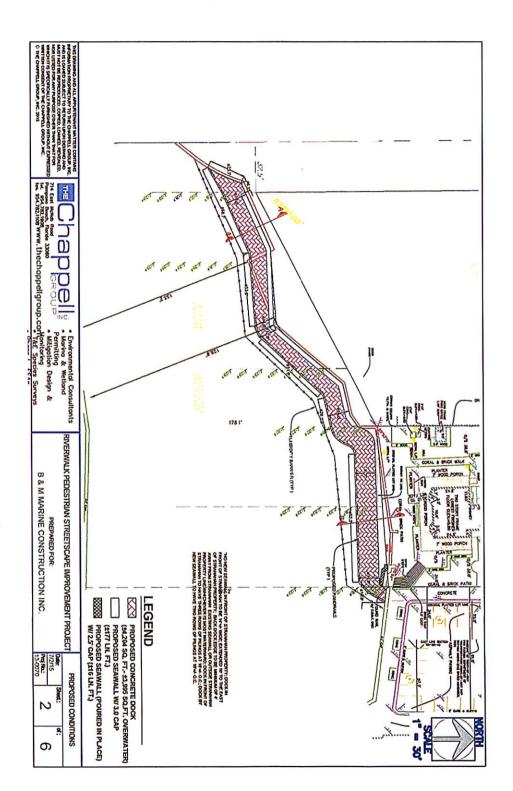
RIVERWALK EXTENSION PROJECT AREA
